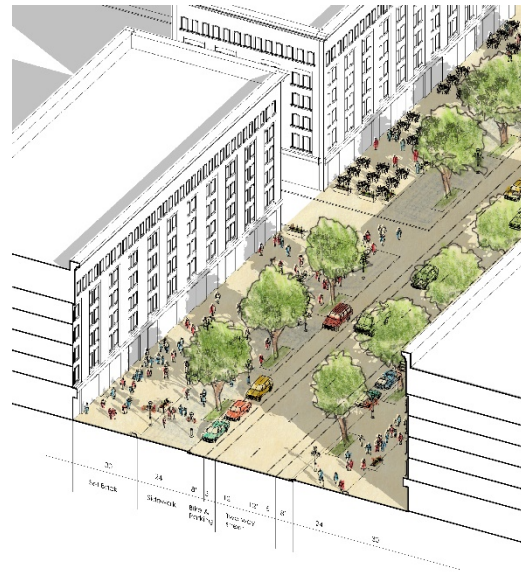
East Capitol St. Mid-Rise Apartment Section (Source: Christopher Ramirez)
